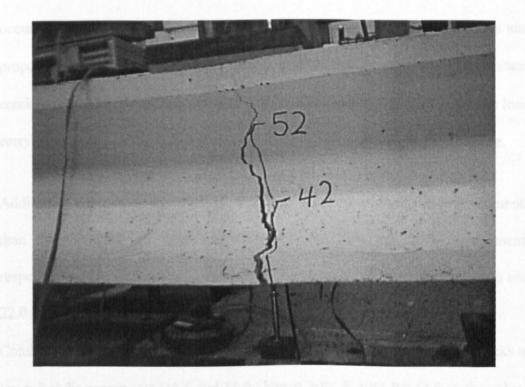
Typical flexural cracks for prestressed X-beams
